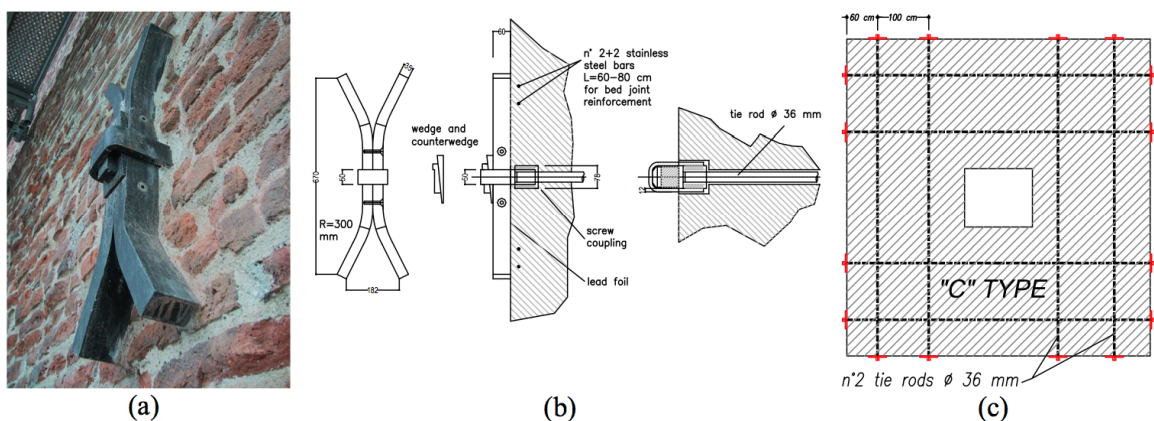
Reinforcing rings in the Civic Tower of Vicenza: a) external view; b) scheme; c) new anchor element and scheme of the “C” type of reinforcing ring.
